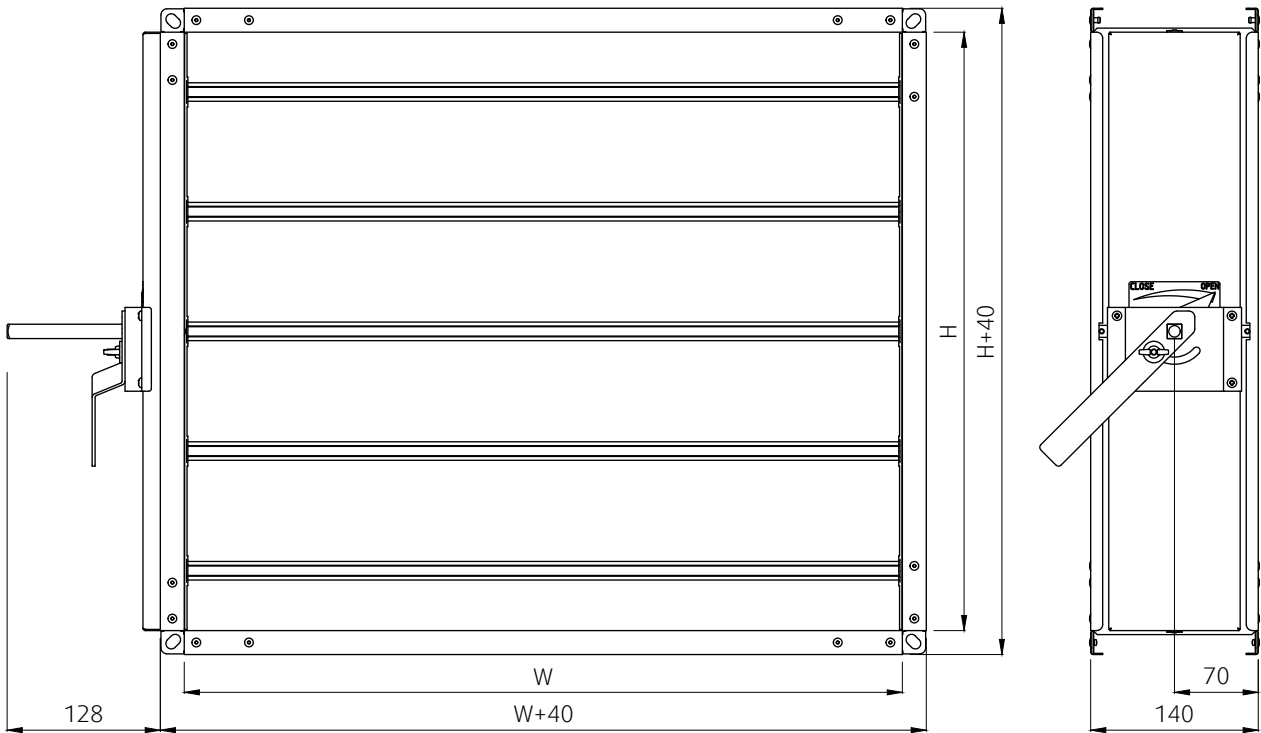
Dimensions of TUNE-S with handle for manual adjustment
